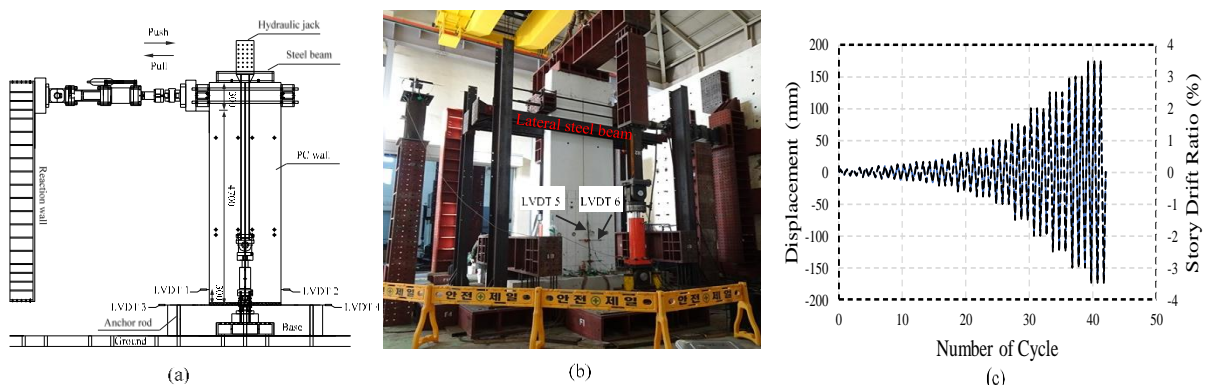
Test setup and instrumentation: (a) schematic; (b) photograph; (c) loading
